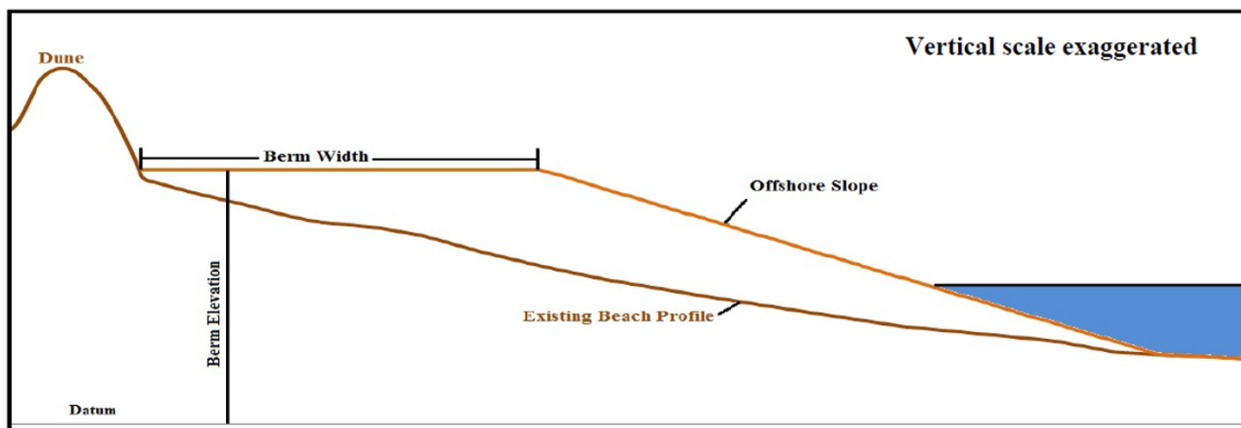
Beach profiles defined by berm width, berm elevation, and offshore slope (from WHG [2011]).
